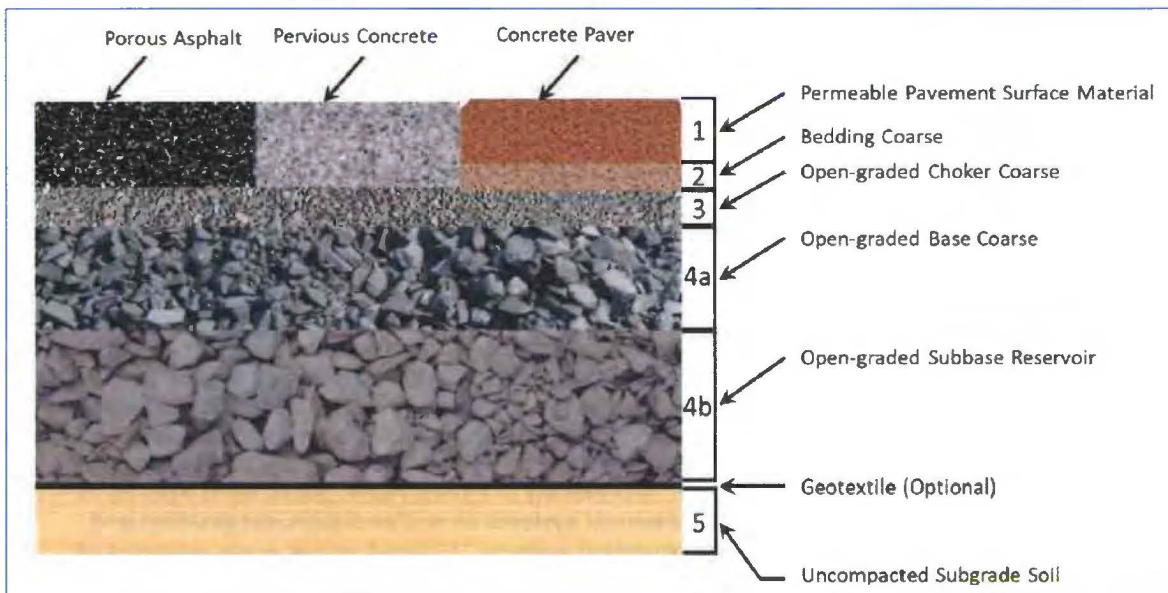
Typical Permeable Pavement Cross-Section for Common Pavement Types
